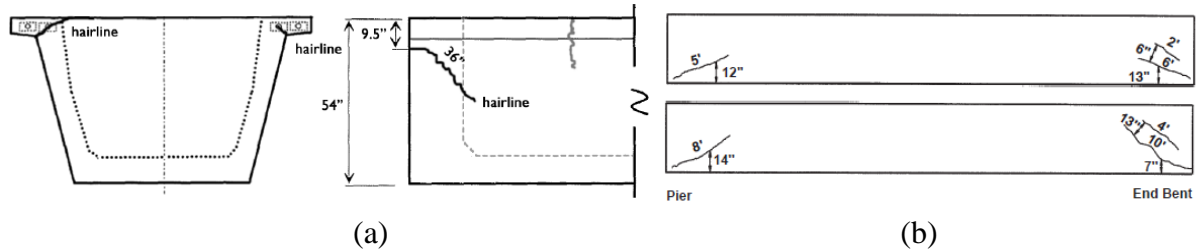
Cracking in tub girders: (a) short-term cracking (Barrios 1994); (b) web cracking during construction (Huang and Shahway 2005)
